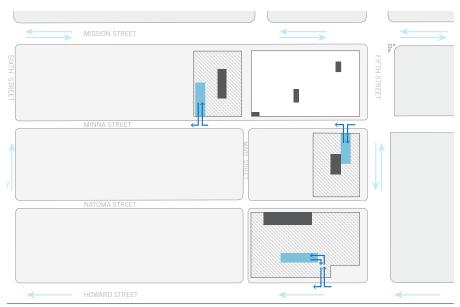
Vehicular Parking: Lower Level 1 Sample Plan Diagram
